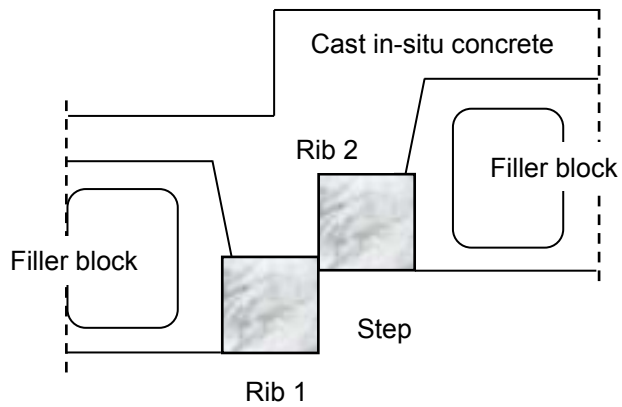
Step at the bottom of a beam and block slab system (parallel to ribs)
